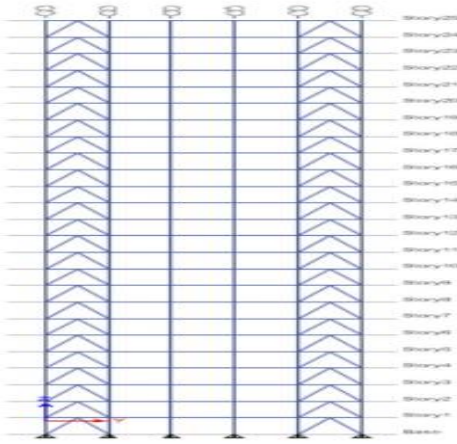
(c) Elevation of Inv. V-Type Bracing system
